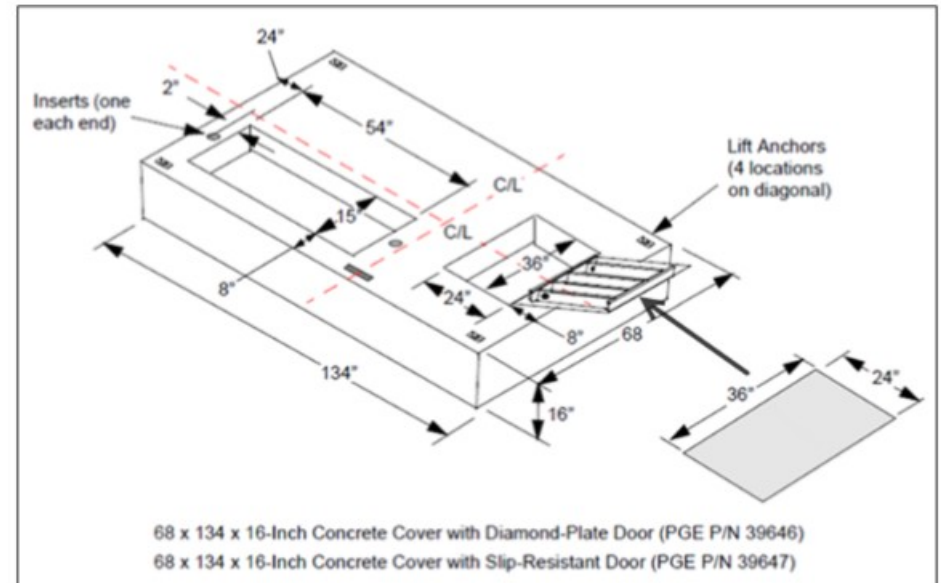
Design Details of Concrete Covers for 68" x 134" x 70" Concrete Vaults
